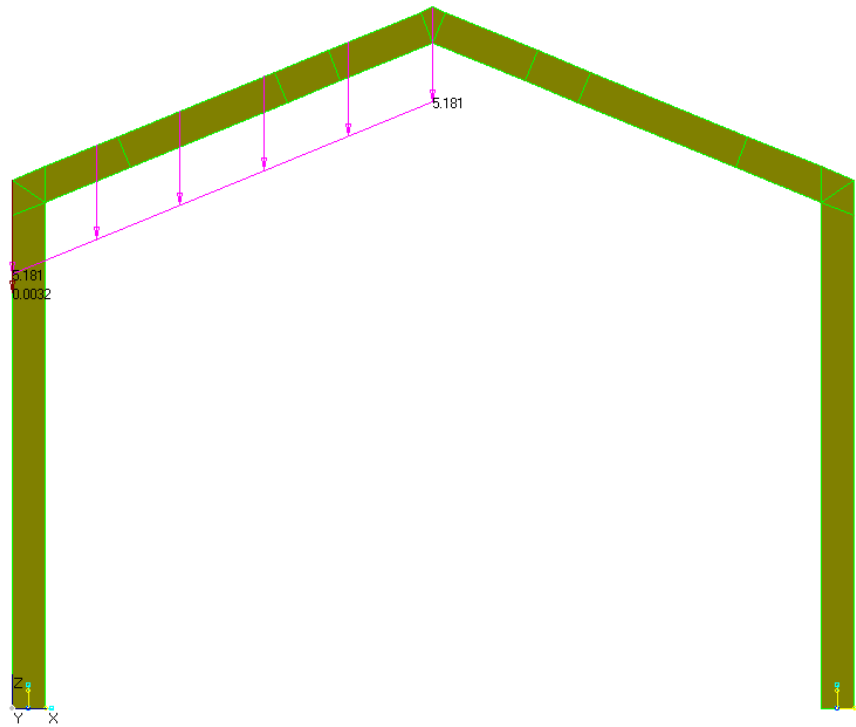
Gable roof building. The design snow load on the left, acting in the direction of the Z-axis, kN/m^2
